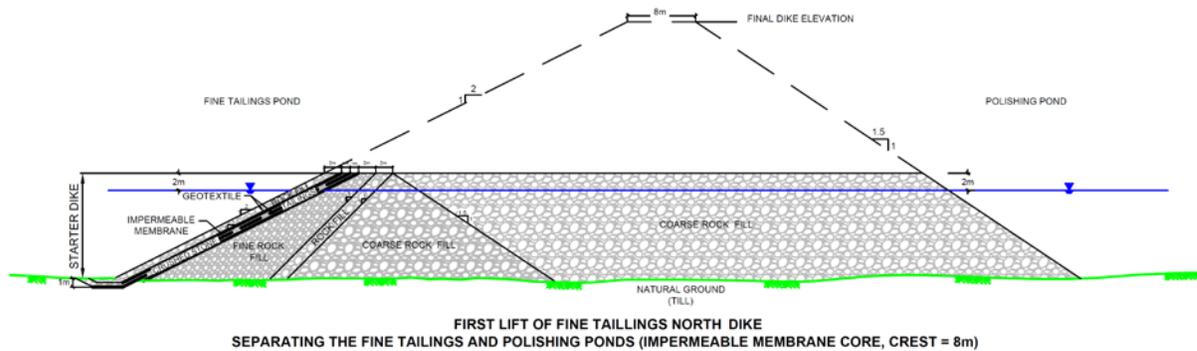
Initial Construction Step of the Tailings Pond North Dike
